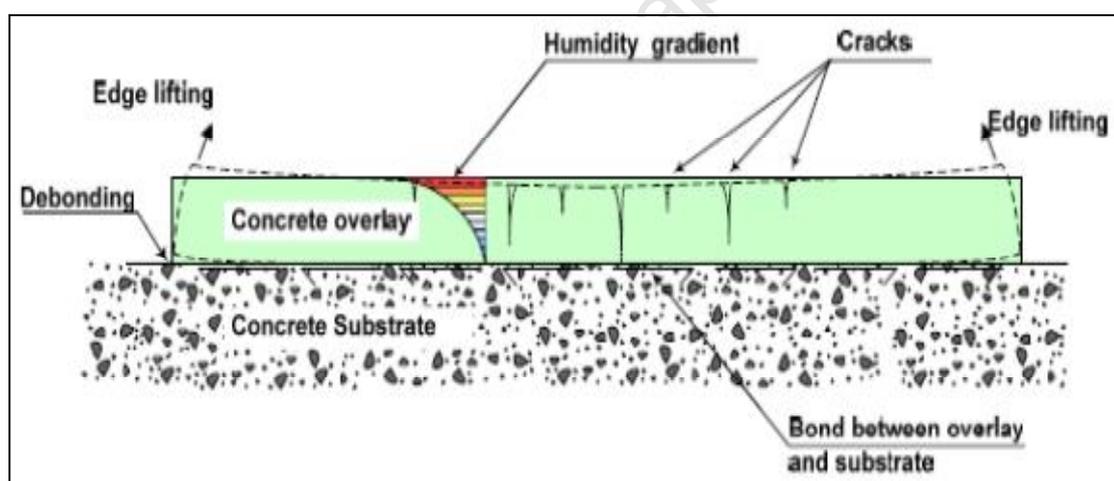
Failure modes of concrete overlays (Carlswärd, 2006).
